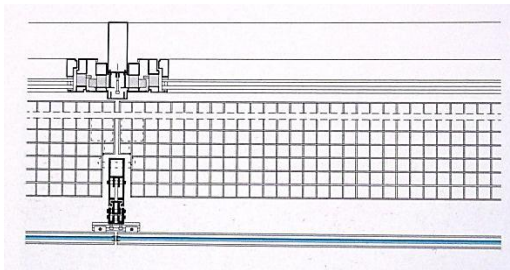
Plan section of the Würth Solar CIS Factory's façade in Schwabisch Hall, Germany (Lüling, 2009).
